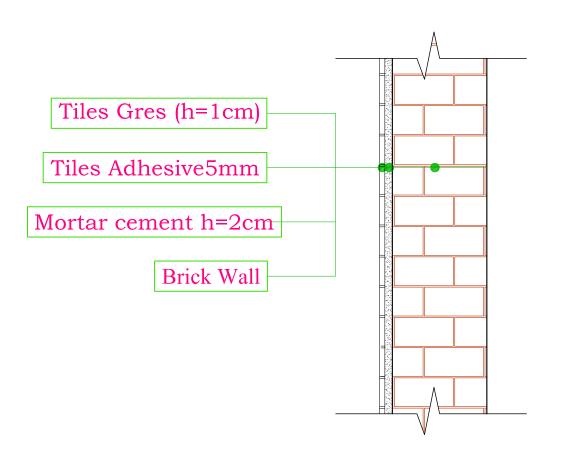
DETAIL OF TOILET PAVEMENT LAYERS Sc 1:50
